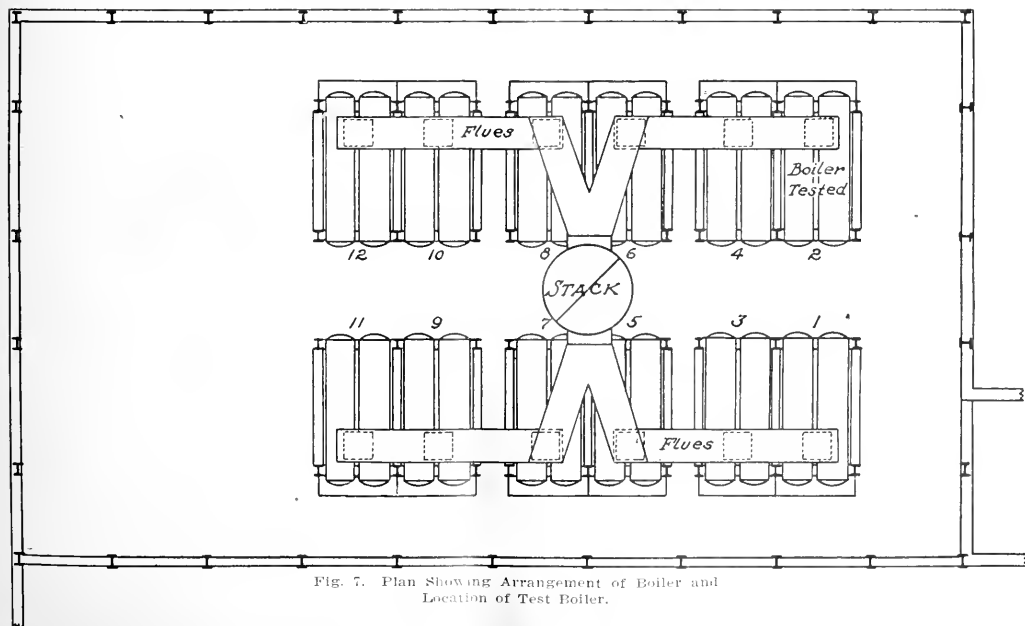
Plan Showing Arrangement of Boiler and Location of Test Boiler.
